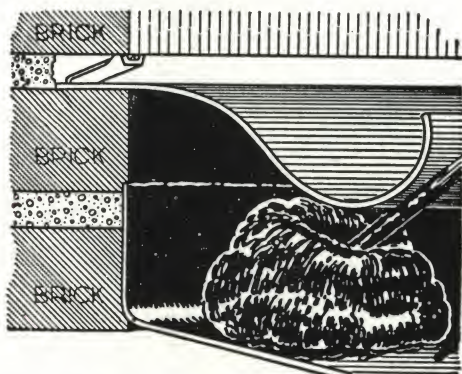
Cement flashing to wall and turned-up portion of roof covering. Care should be taken here to prevent wrinkles
